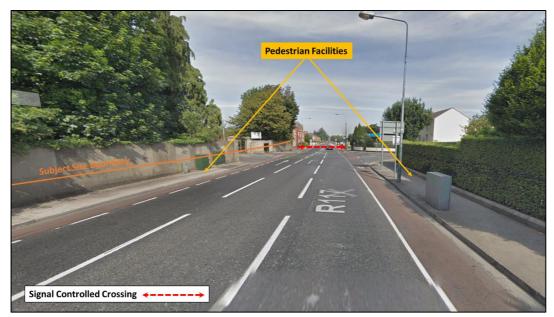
Existing Pedestrian Facilities along Sandford Road in vicinity of existing site access
